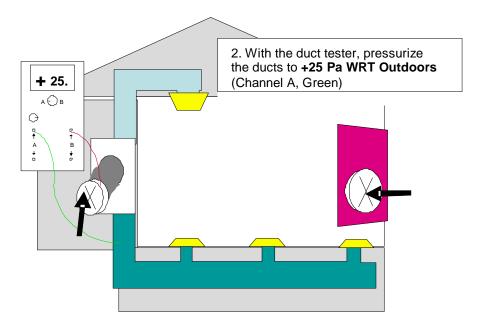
Pressurizing ducts to +25 PA WRT outdoors (duct testing device located outside the pressurized zone of the house).
